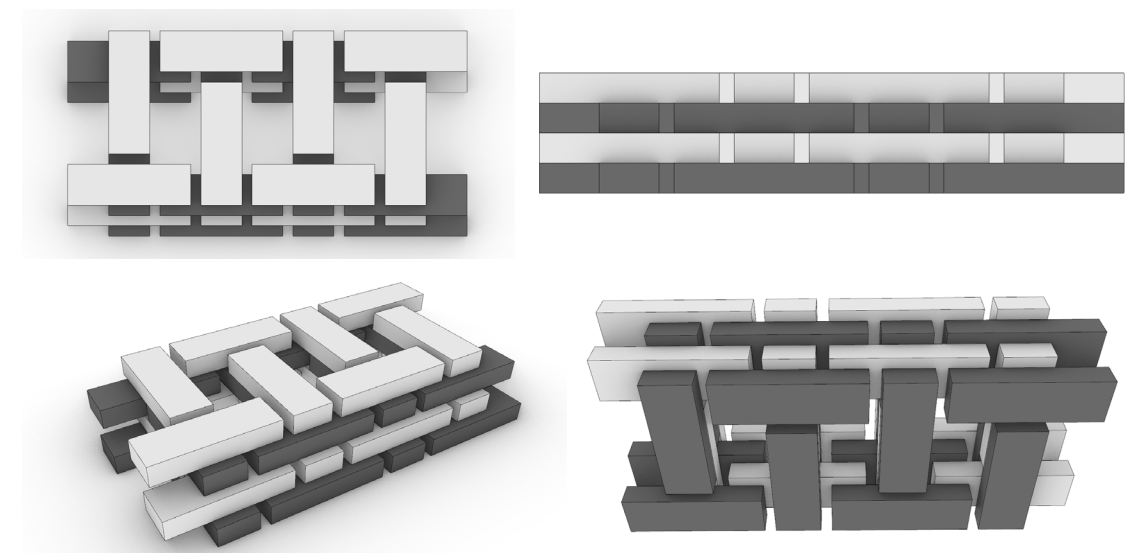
"T" configuration approach, layers system & overlapping: (top left) plan view; (top right) front view; (bottom left) top perspective view ; (bottom -right) bottom perspective view.
